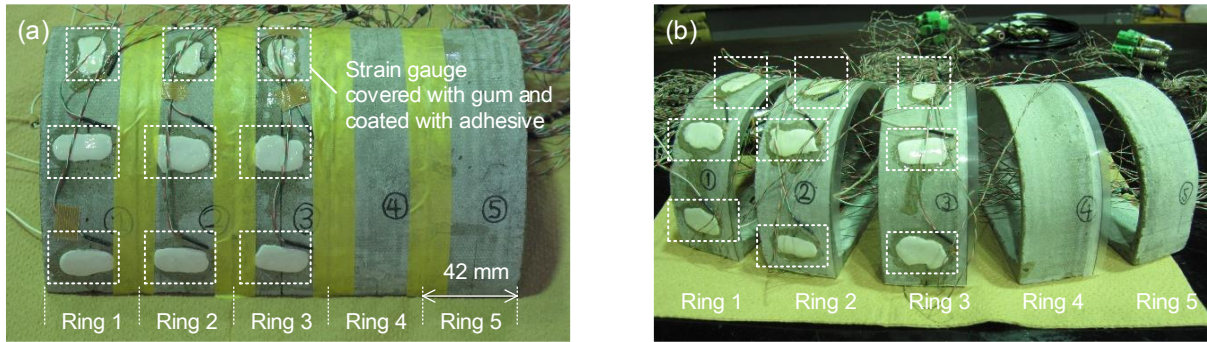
Arch culvert model due to two structural conditions: (a) connected condition by adhesive for concrete and (b) separated condition. In the connected condition, the joint of the arch culverts was protected with masking tape. In the separated condition, a polypropylene sheet was used to cover the joint sections of the culverts to prevent soil infiltration.
